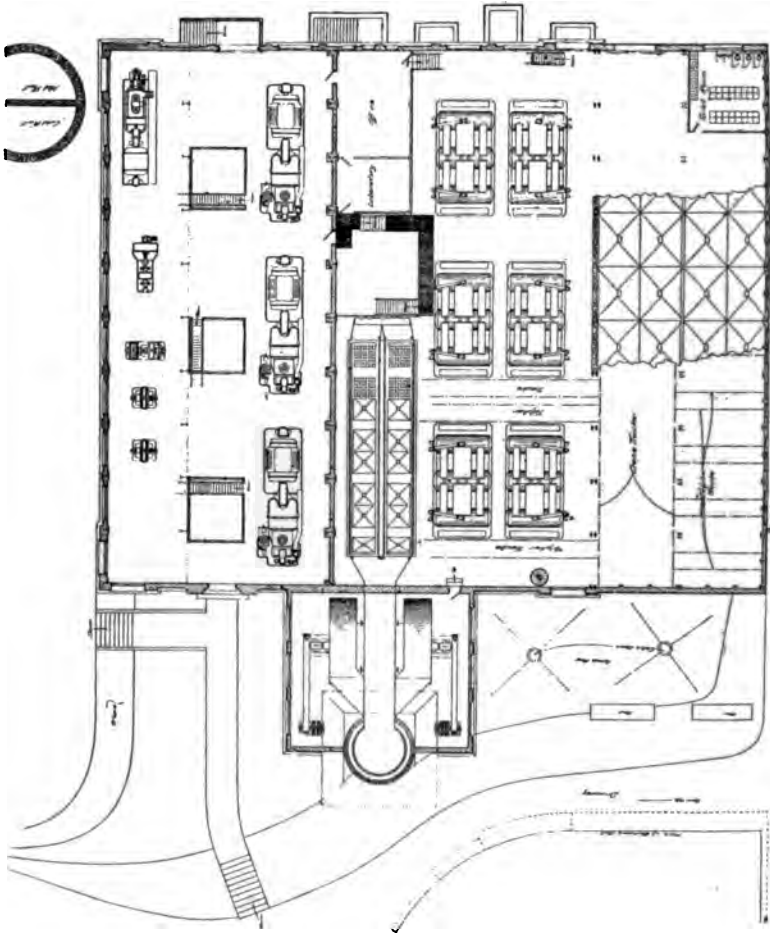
FLOOR PLAN OF THE CLEVELAND MUNICIPAL LIGHTING PLANT
